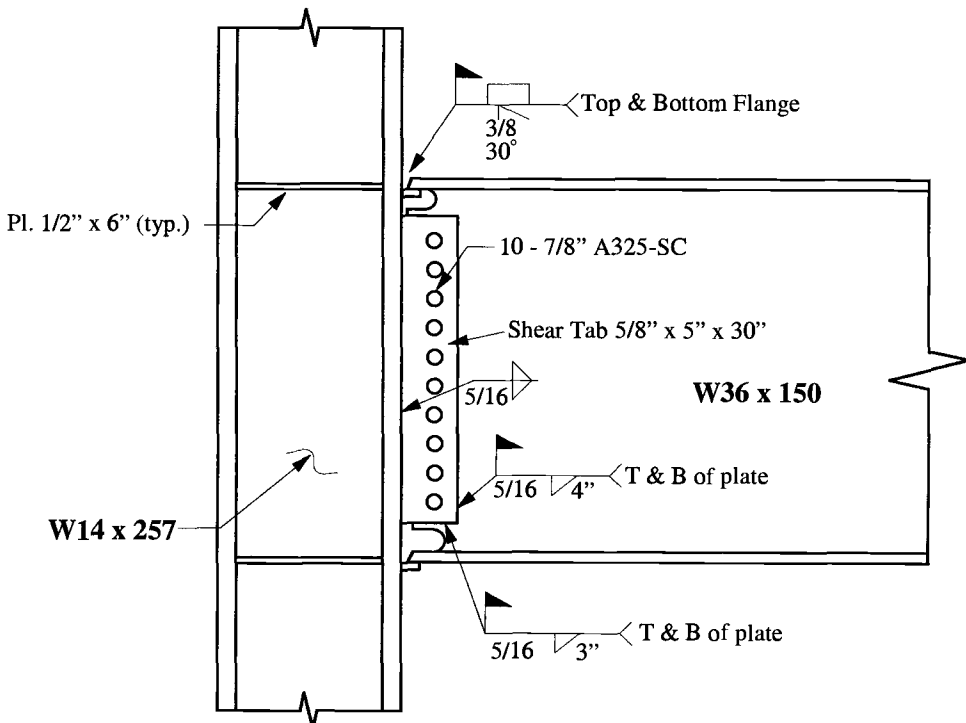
Typical welded-flange bolted-web moment connection.
